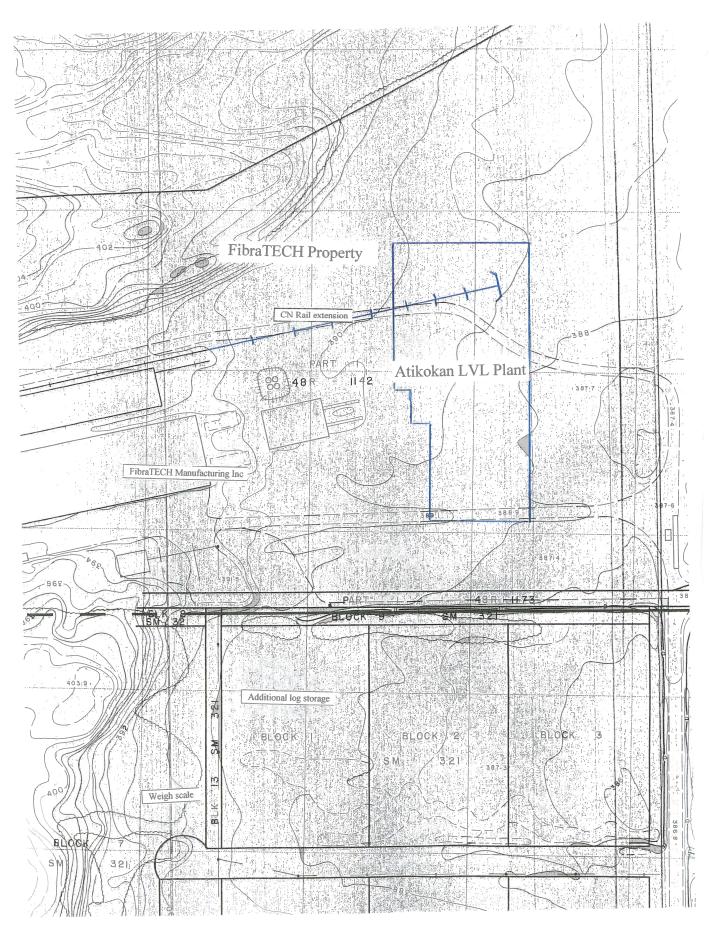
Figure LVL proposed site adjacent to Fibratech Manufacturing Inc
